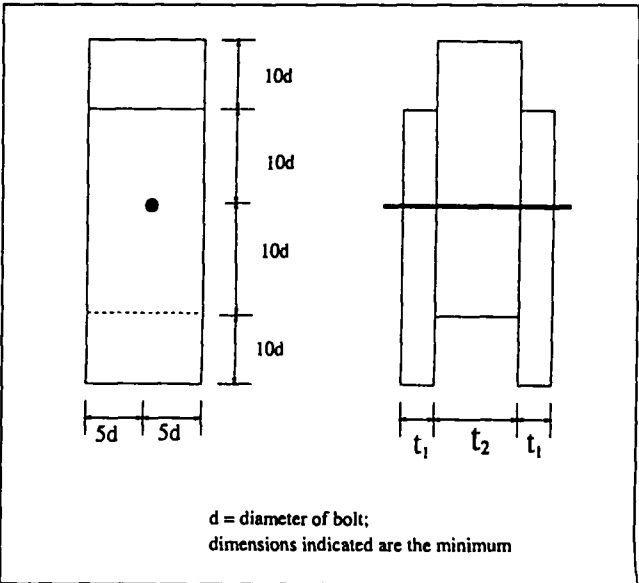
Dimensions of test specimen for bolts of diameter 12.7 mm and 15.9 mm
